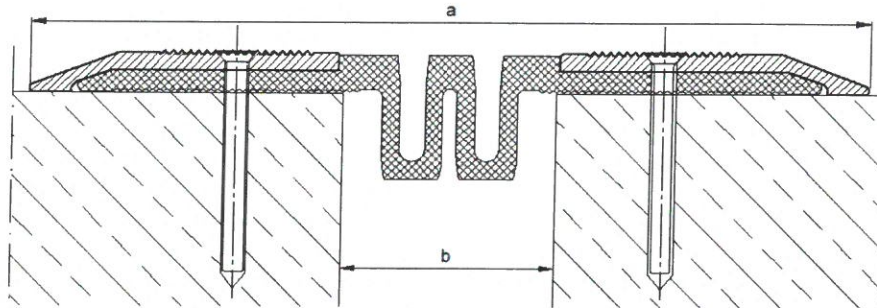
CONECTO PARK SL 210.50.N waterproof expansion joint profile – surface installation
